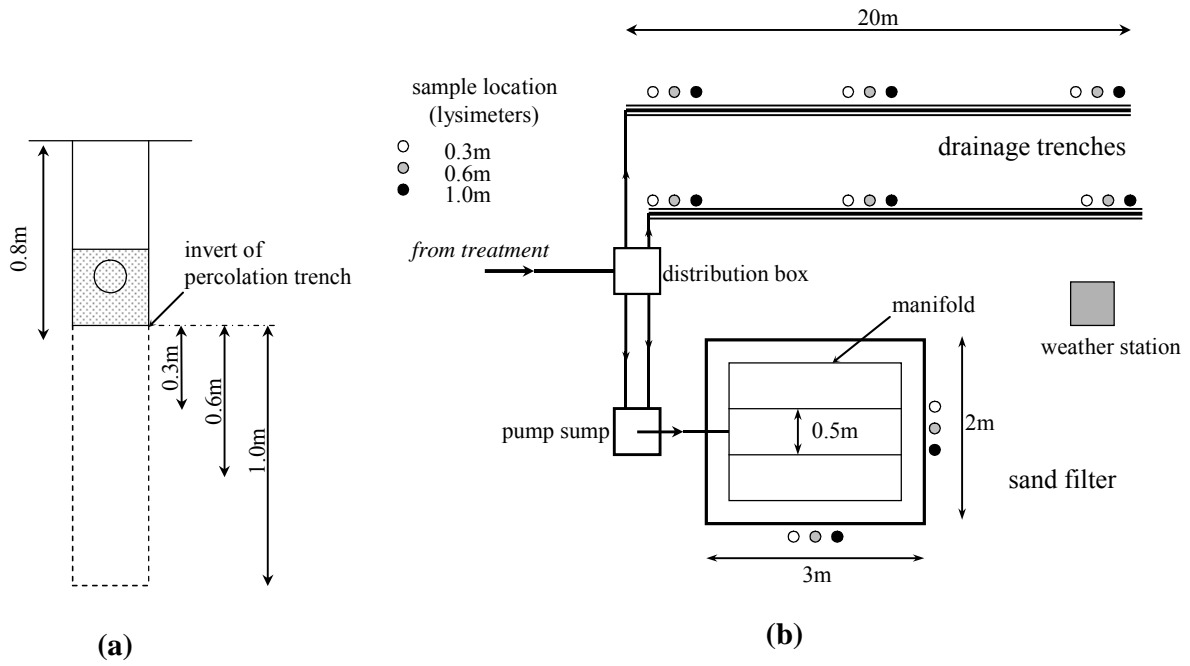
Site layout: (a) Cross-section and depths of instrumentation (b) Plan view of trenches and stratified sand filter (*not to scale*).
